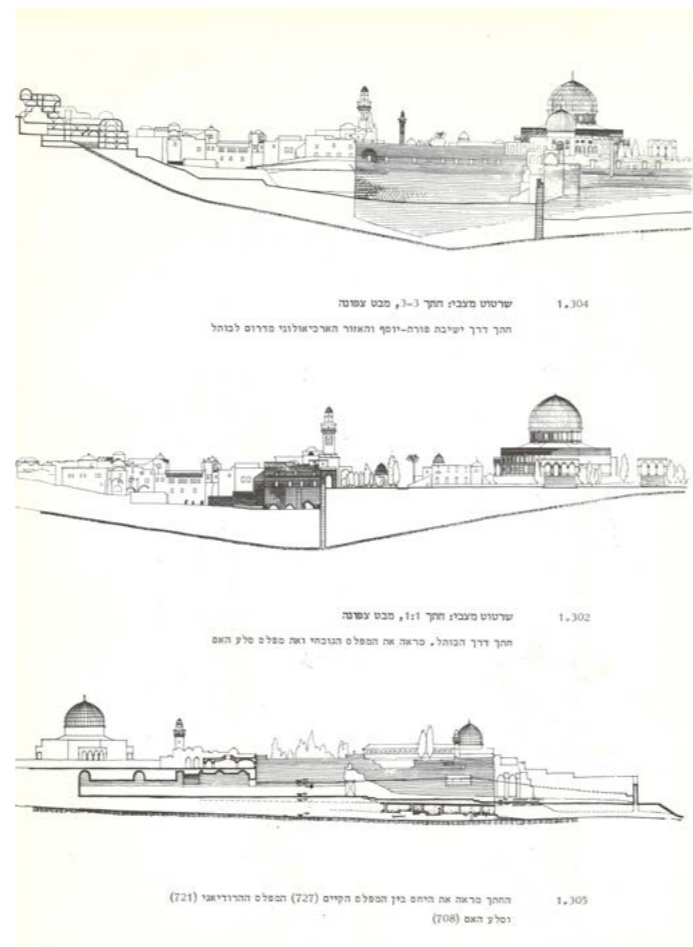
Sections of Wailing Wall area, Planning Guidelines for the Western Wall Area, Art Kutcher, 1973
